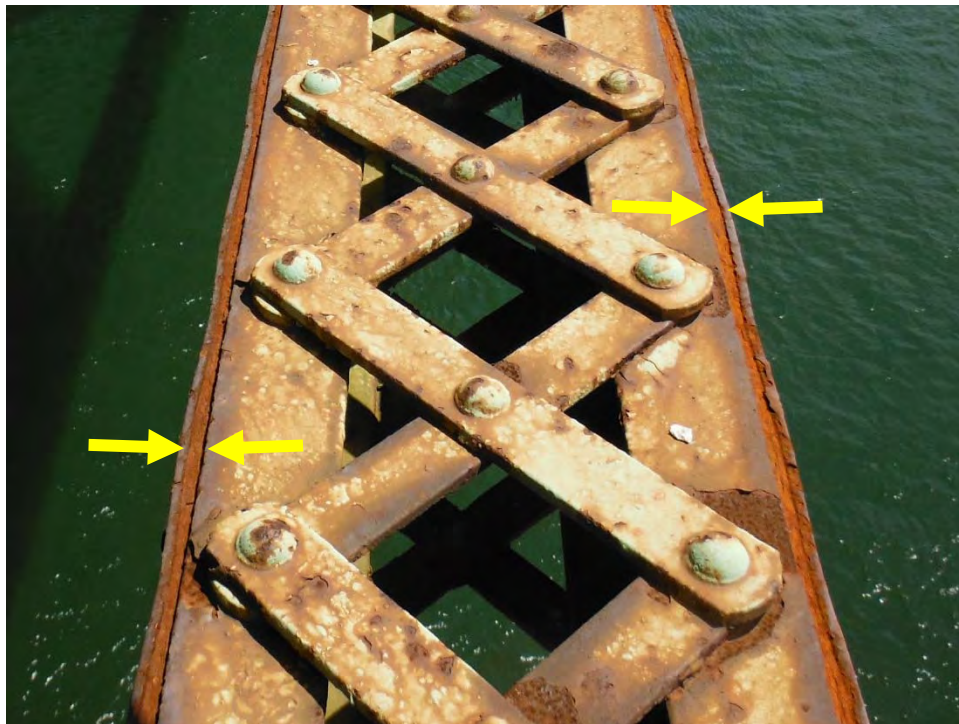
Span 6 – Pack Rust Between Channel and Web Plate
